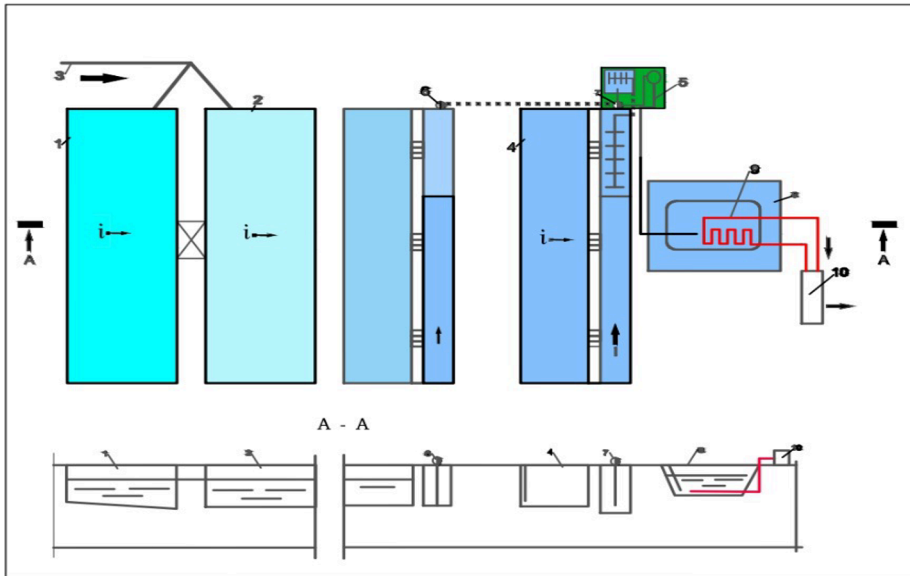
Experimental flow chart of drainage water reuse technology in plan and section A-A: Legends: 1, 2 – drainage pipeline. 3 – drainage water. 4 – drainage water storage tank. 5 – drainage water treatment unit. 6, 7 – pumping units. 8 – tank. 9 – pipeline. 10 – desalinated water.
